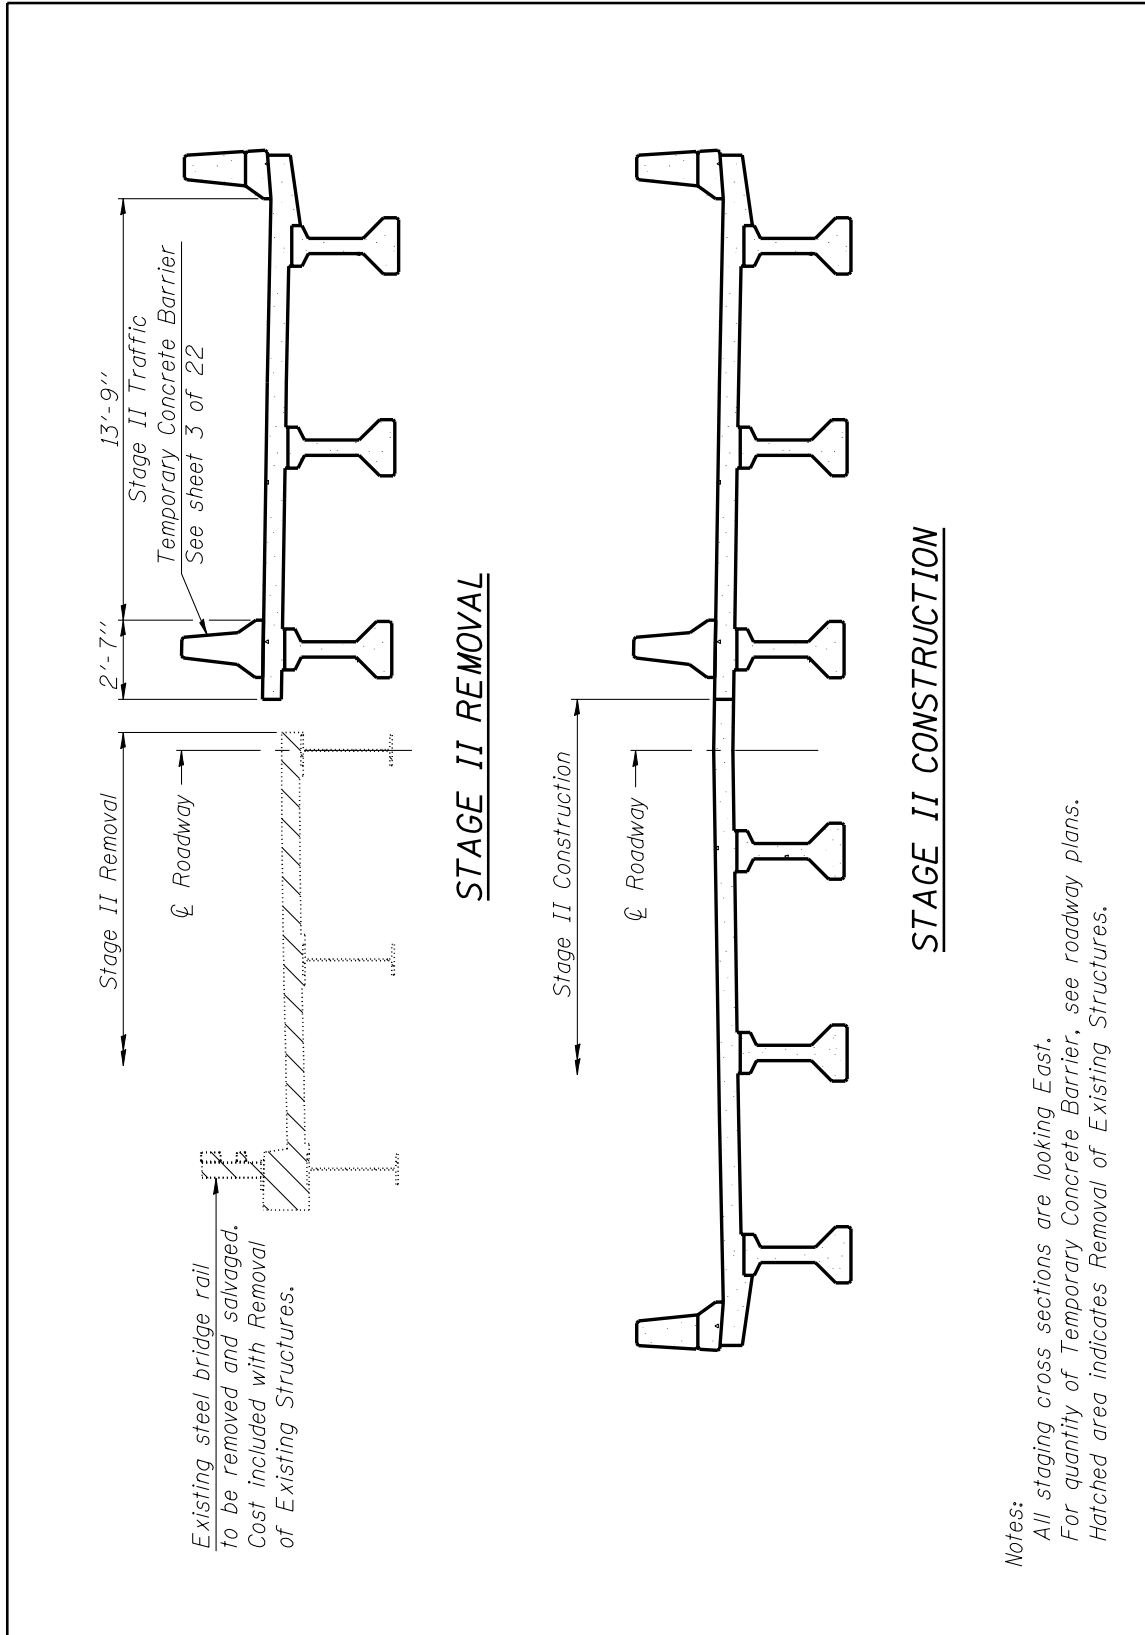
Acceptable Detailing for Stage II Removal and Construction
